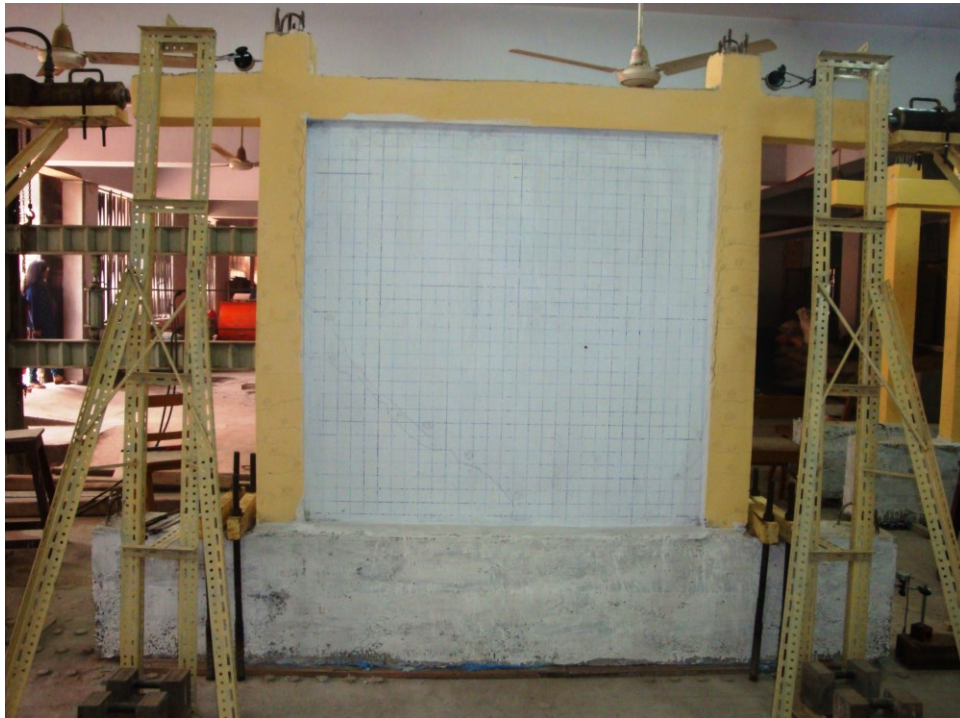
Positions of tripod stands for mounting displacement transducers
